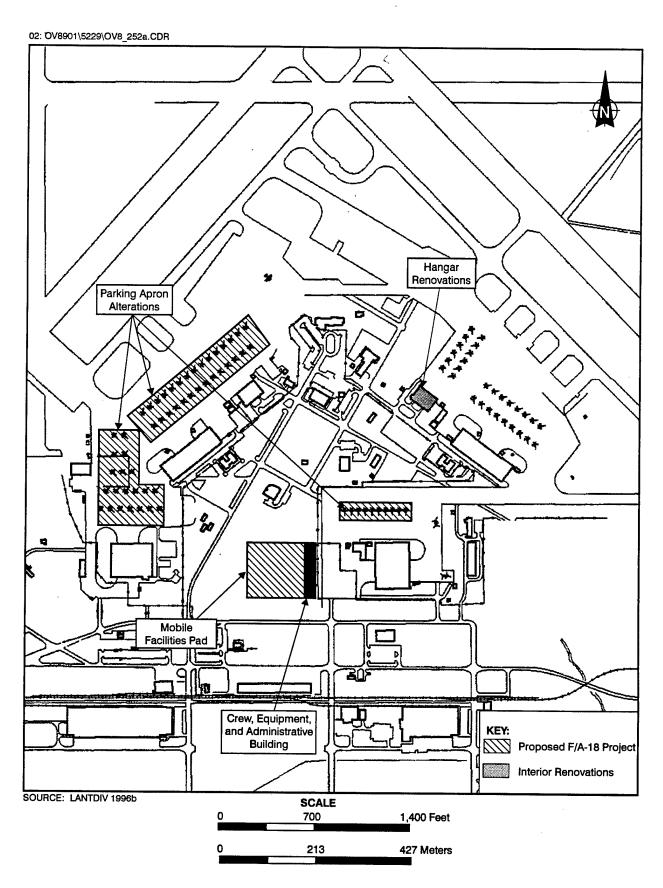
CONSTRUCTION NEEDED AT MCAS BEAUFORT TO SUPPORT ARS 2
